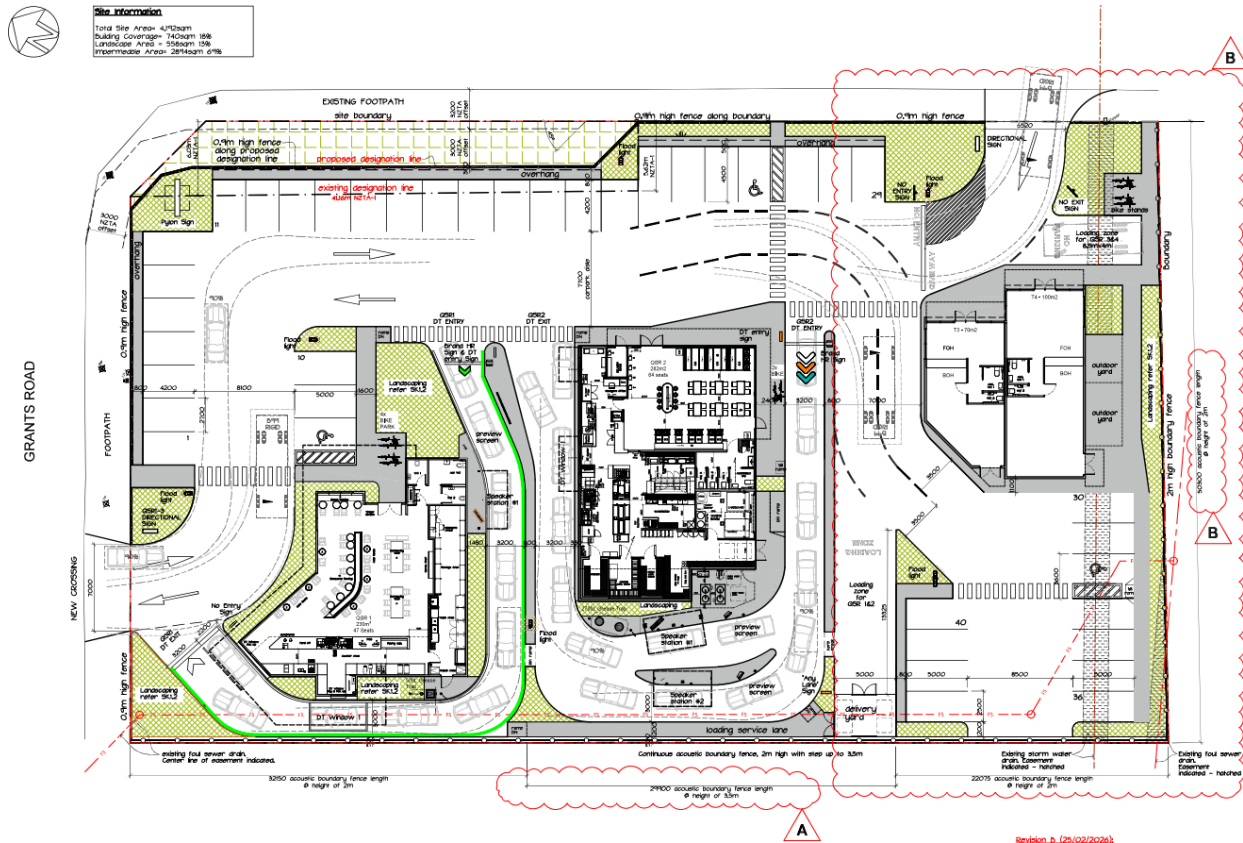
Proposed commercial development at 192-208 Evans Street (proposal plan dated 26/02/2026).
